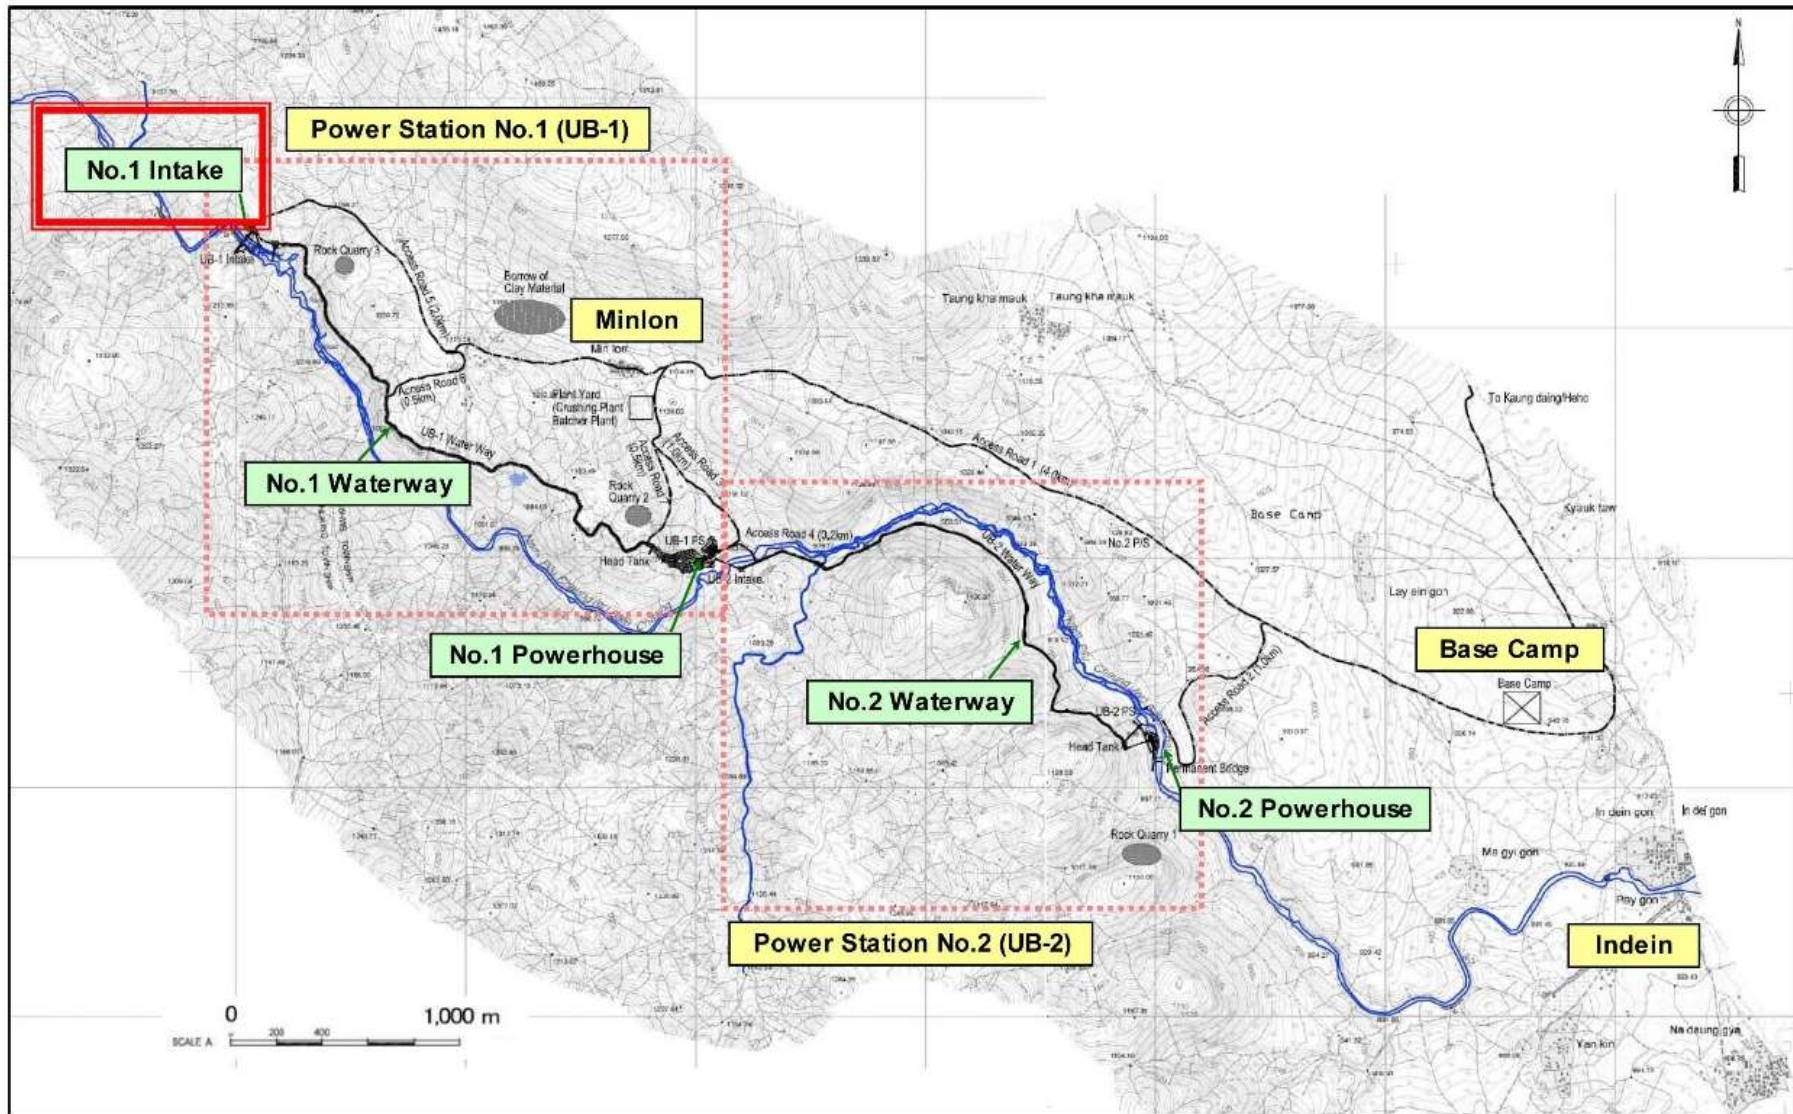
General Layout Plan of the Upper Baluchaung Hydropower Project.
